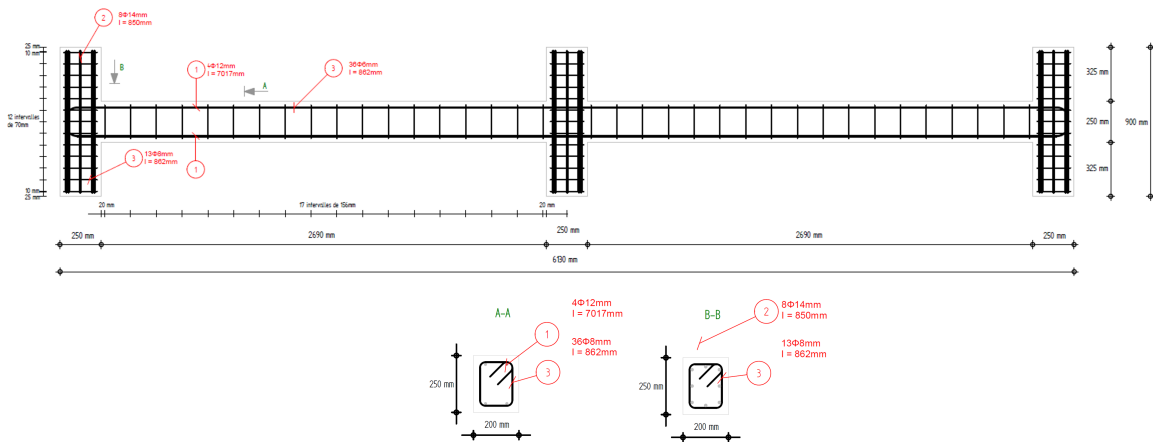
Beam and reinforcement dimensions - Campaign 01, 2023
